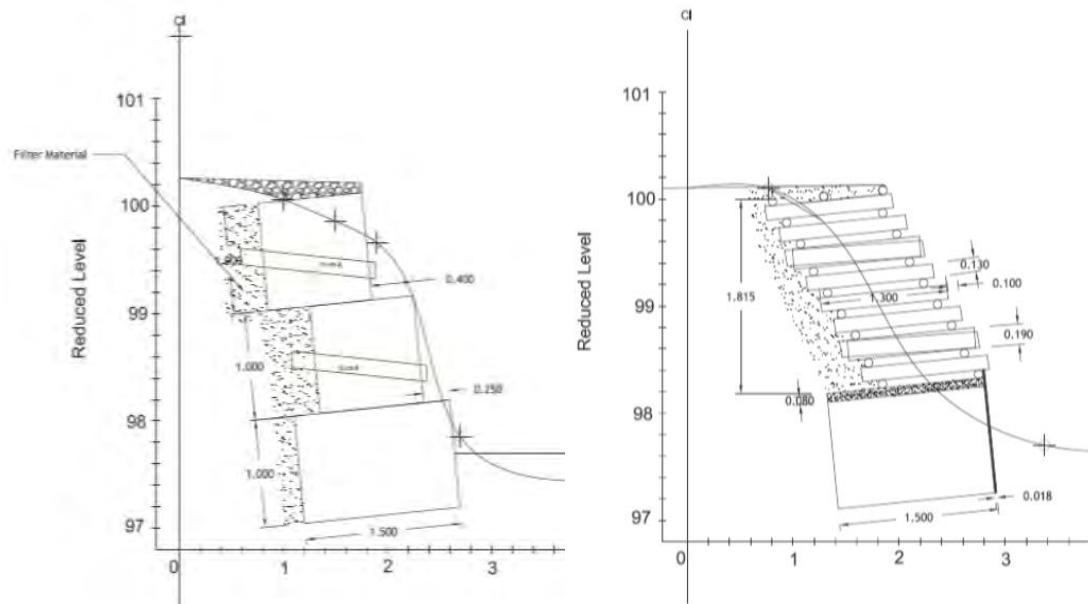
Cross sections of retaining wall (gabion and crib) constructed at Kusunti, Lalitpur[28]
